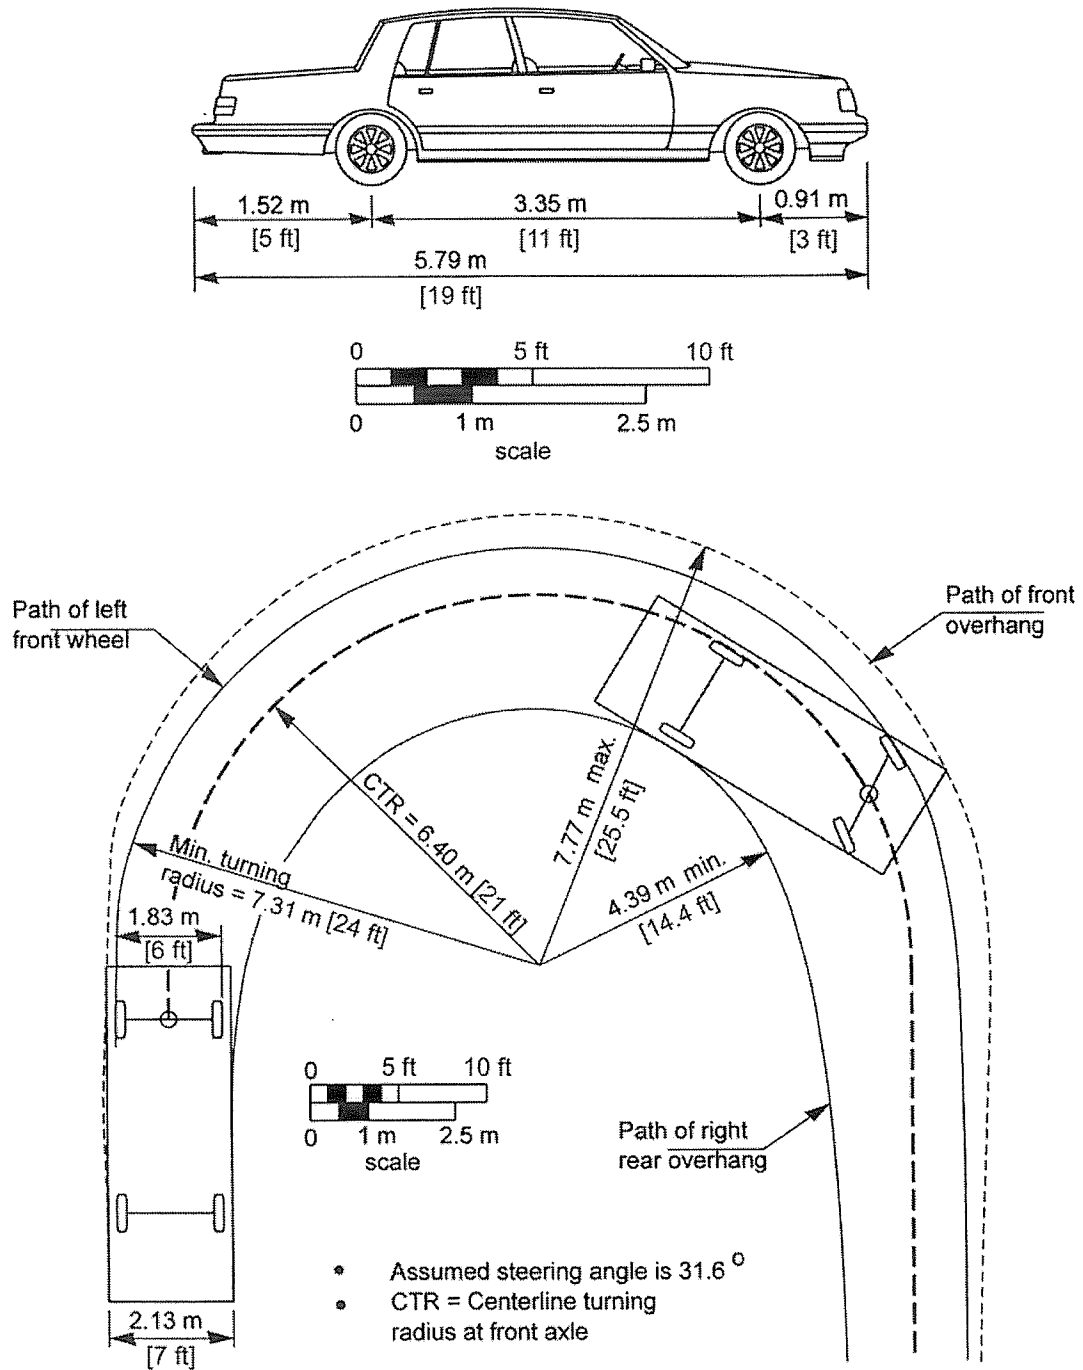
Minimum Turning Path for Passenger Car (P) Design Vehicle
